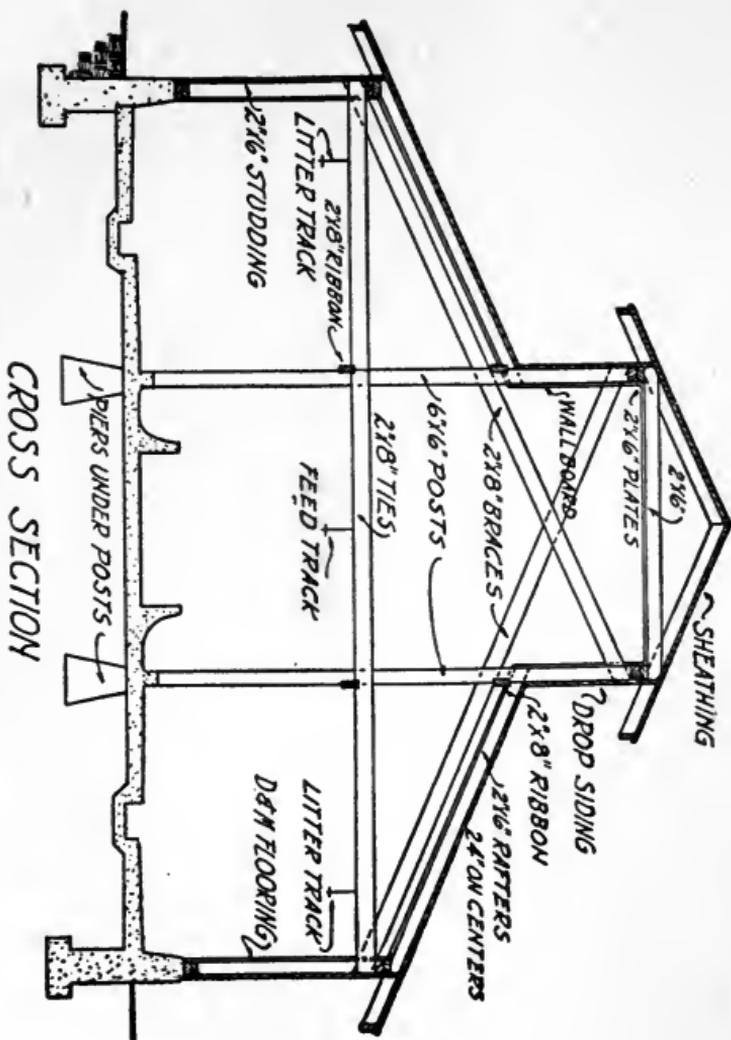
Cross Section Through Monitor Roof Dairy Stable
